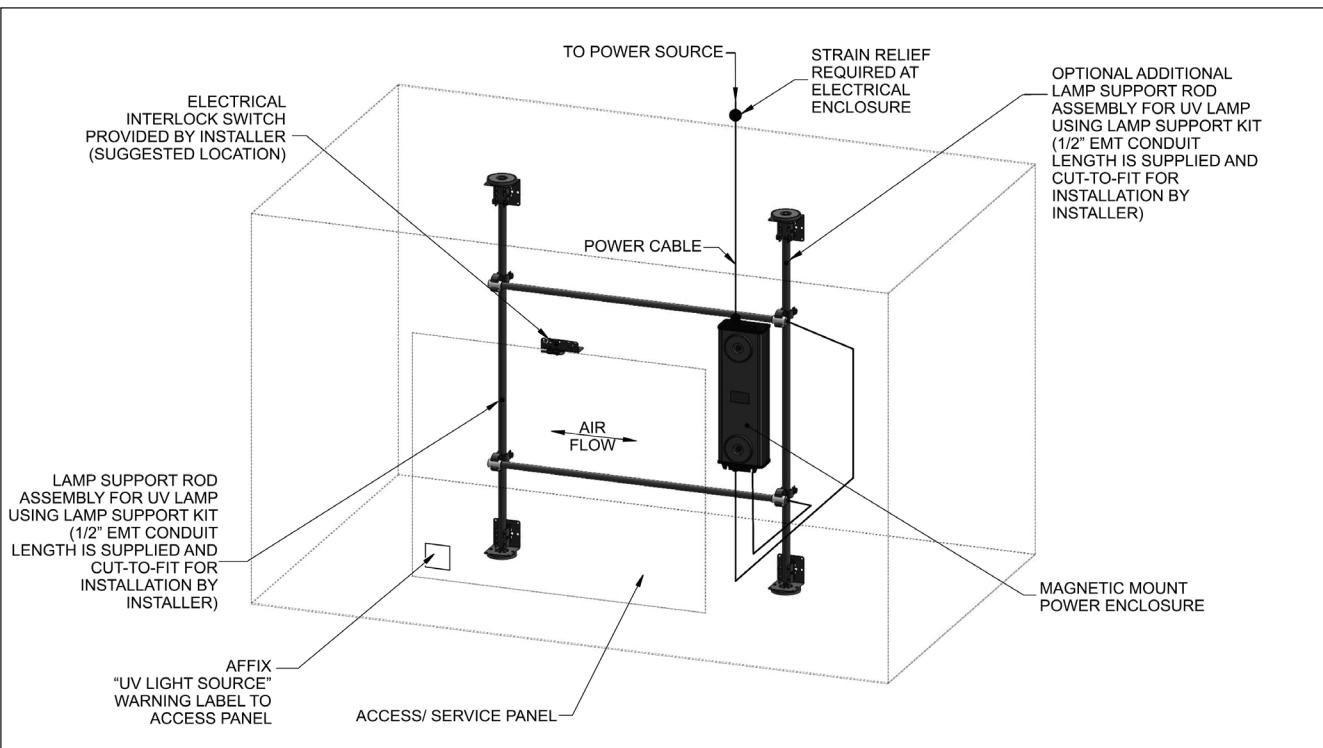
Generic HVAC Ducted Installation (H Style Rod Configuration: Vertical Rod Support with Horizontal Lamp) – Requires Additional Lamp Support Kit with EMT Conduit Mounting Brackets and Inverted U-Shaped Brackets Installed in Alternative Rotated Orientation for Installation
